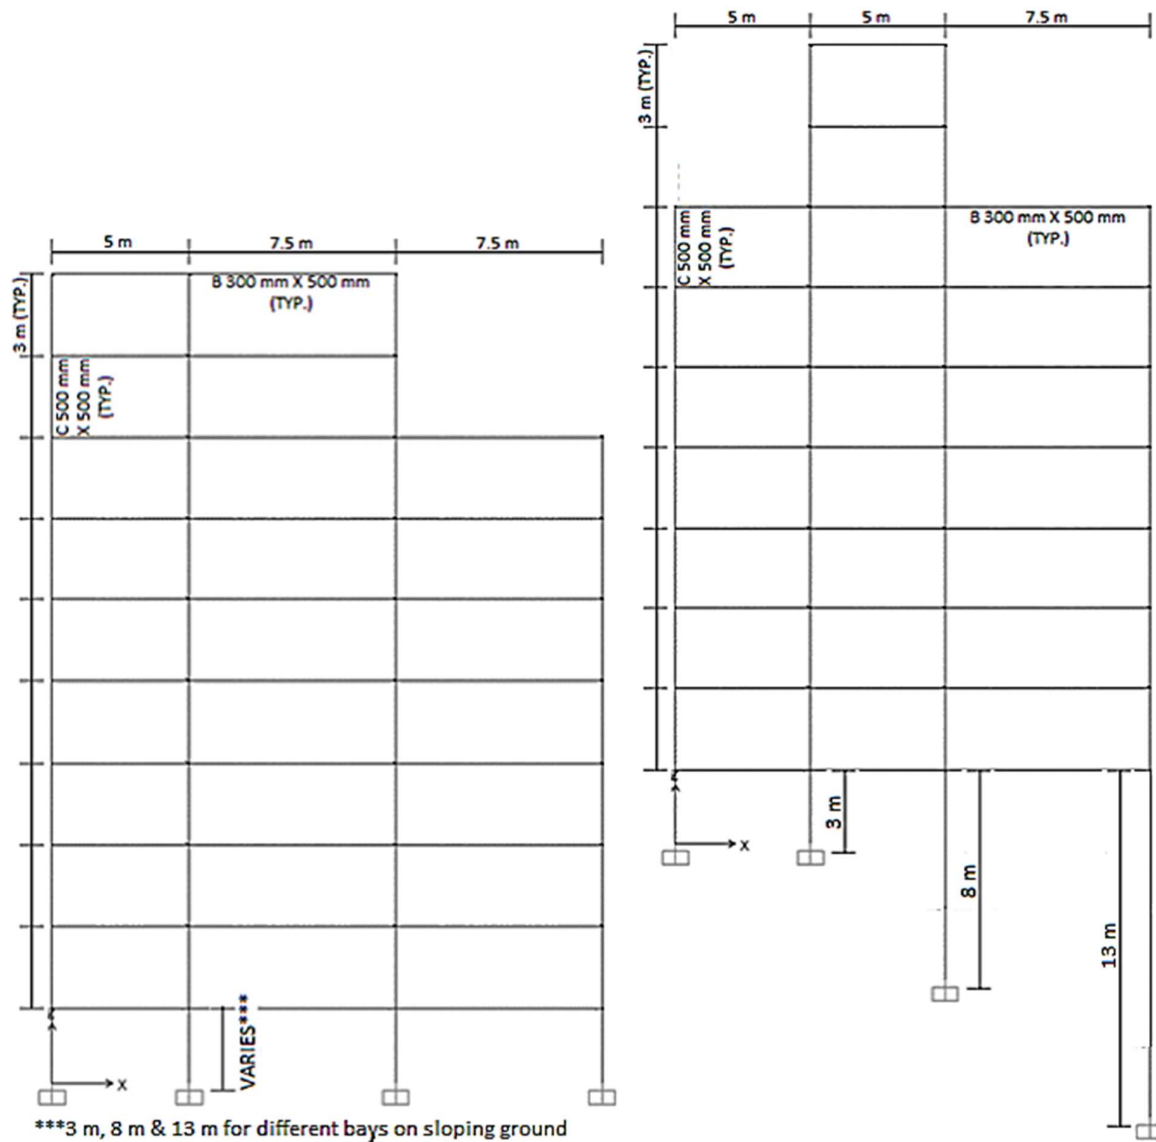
Elevation of the building with vertical irregularity on sloping ground
